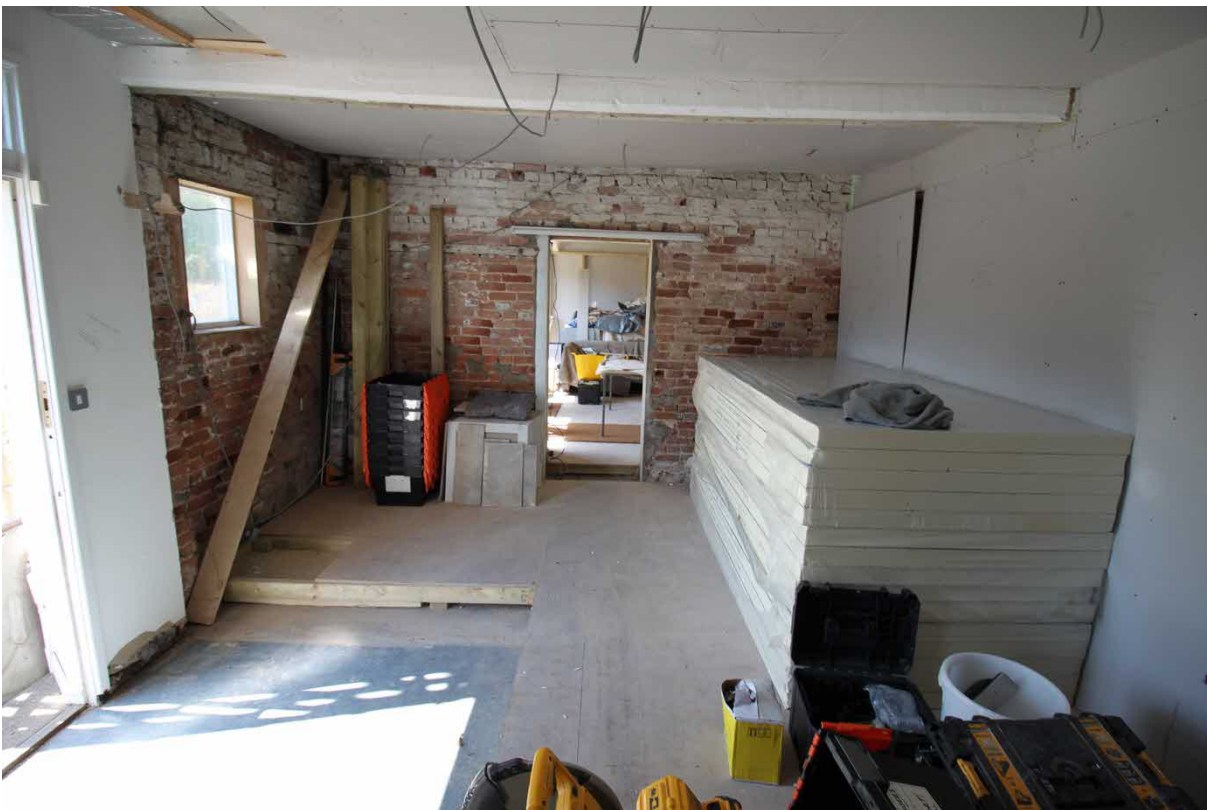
View looking west from inside the ground floor beams and brickwork retained.
